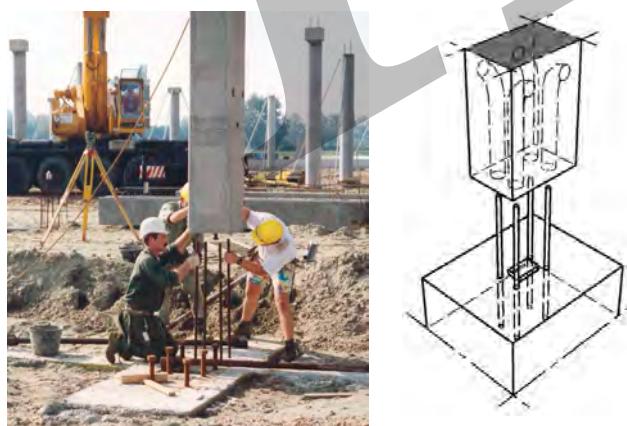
Protruding bars from the foundation positioned in grout ducts in column to enable full moment connection
